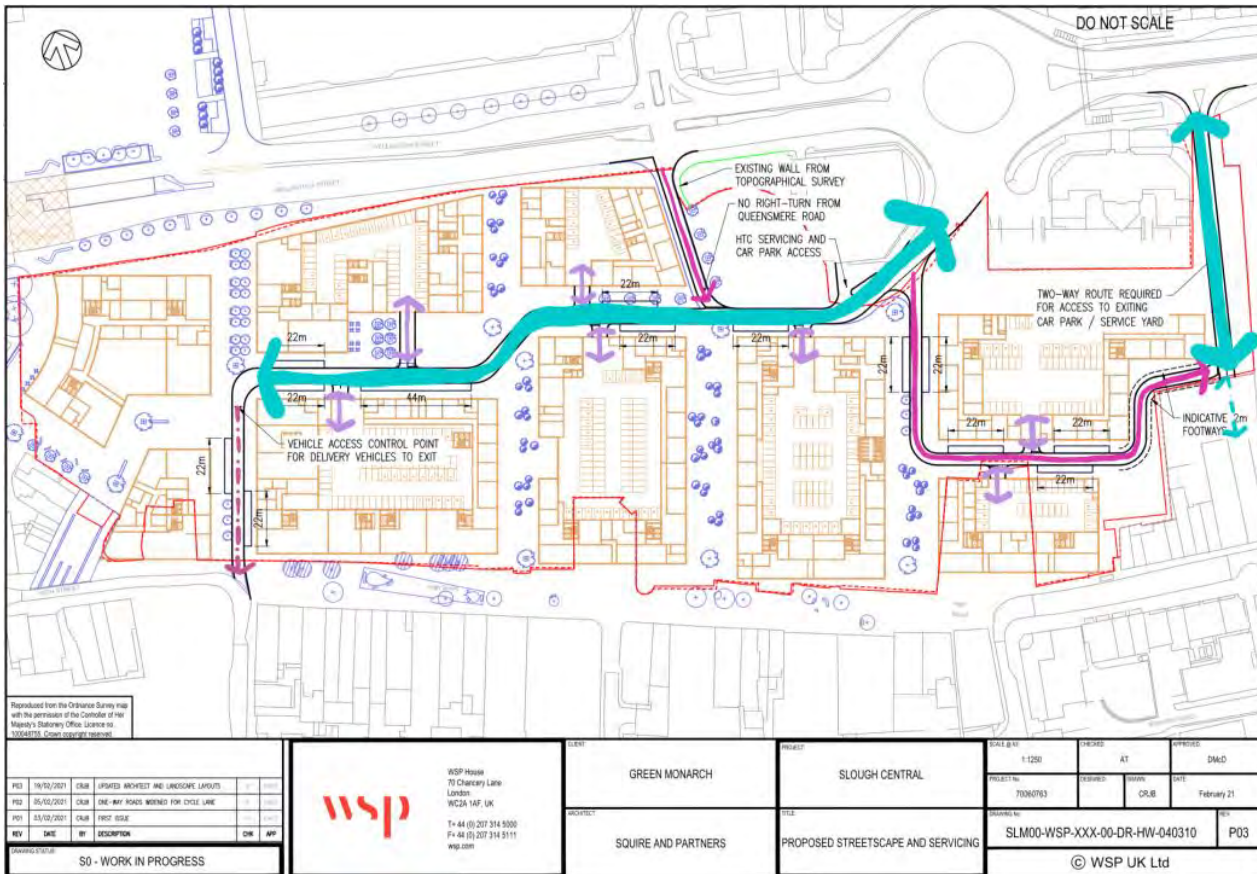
Slough Central Proposed Street Layout (layout and red line indicative and subject to change)
